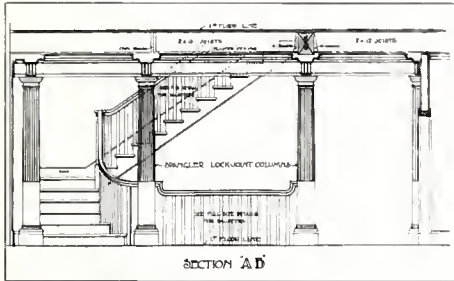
DORMITORY NO. 3/RANDOLPH, DETAIL
